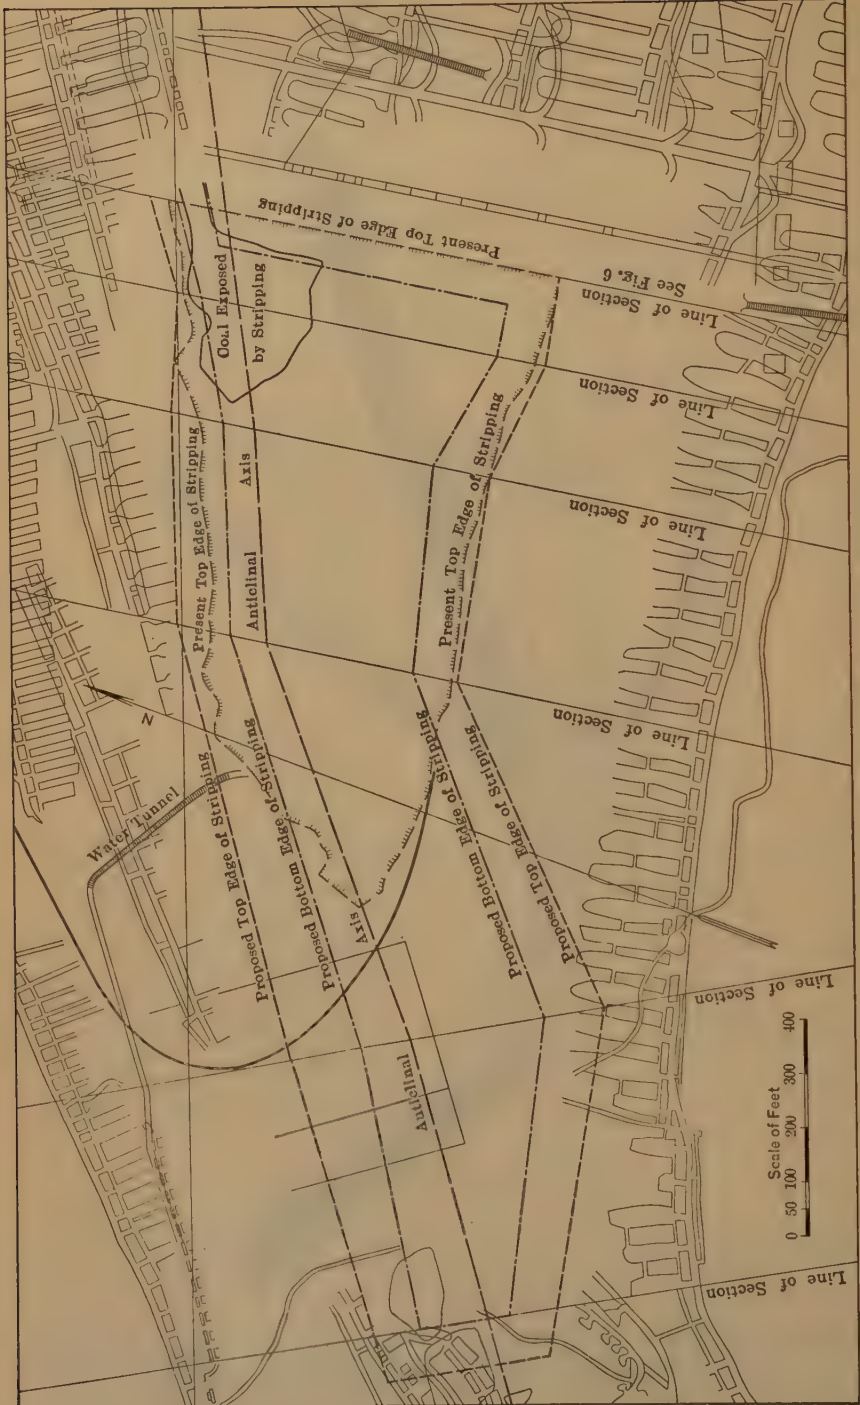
A.—MAP SHOWING PLAN OF STRIPPING.
